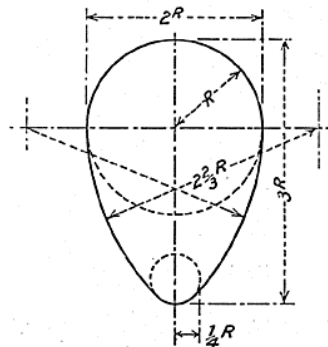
New Type of Section for Brick Sewers suited for both Small and Large Flows.
